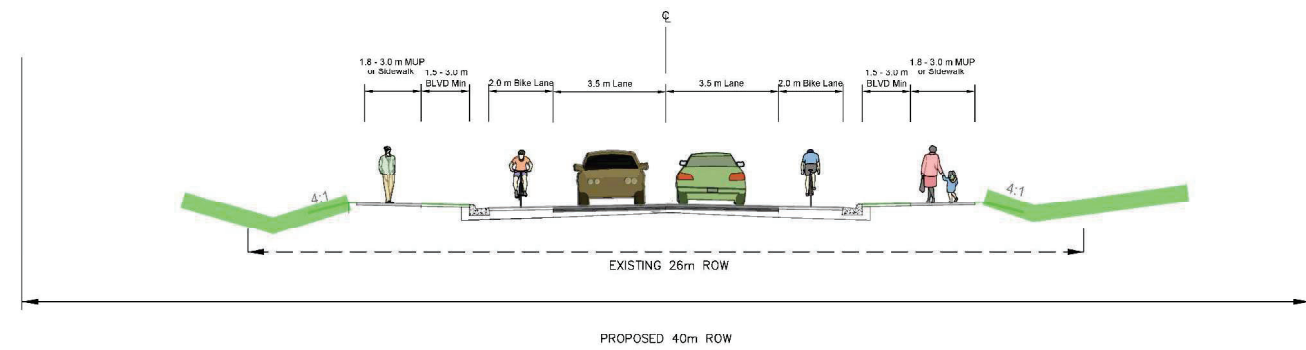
Section 2 Alternative 2 – 2-Lane Urban Cross Section
